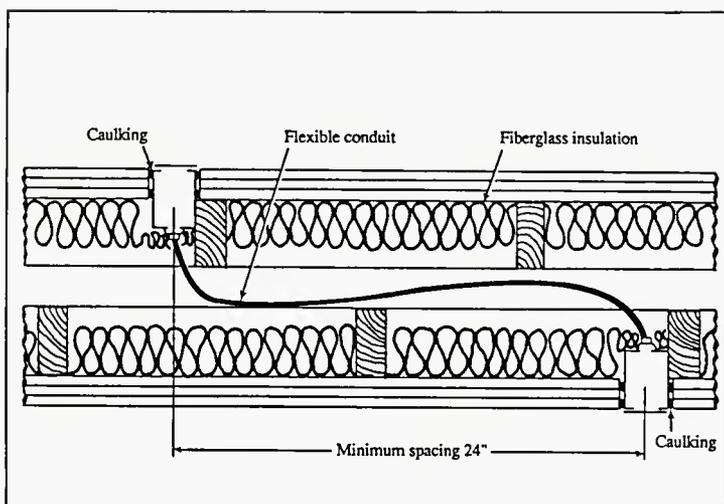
The cross section of the studio/control room wall. Note the staggered access openings
